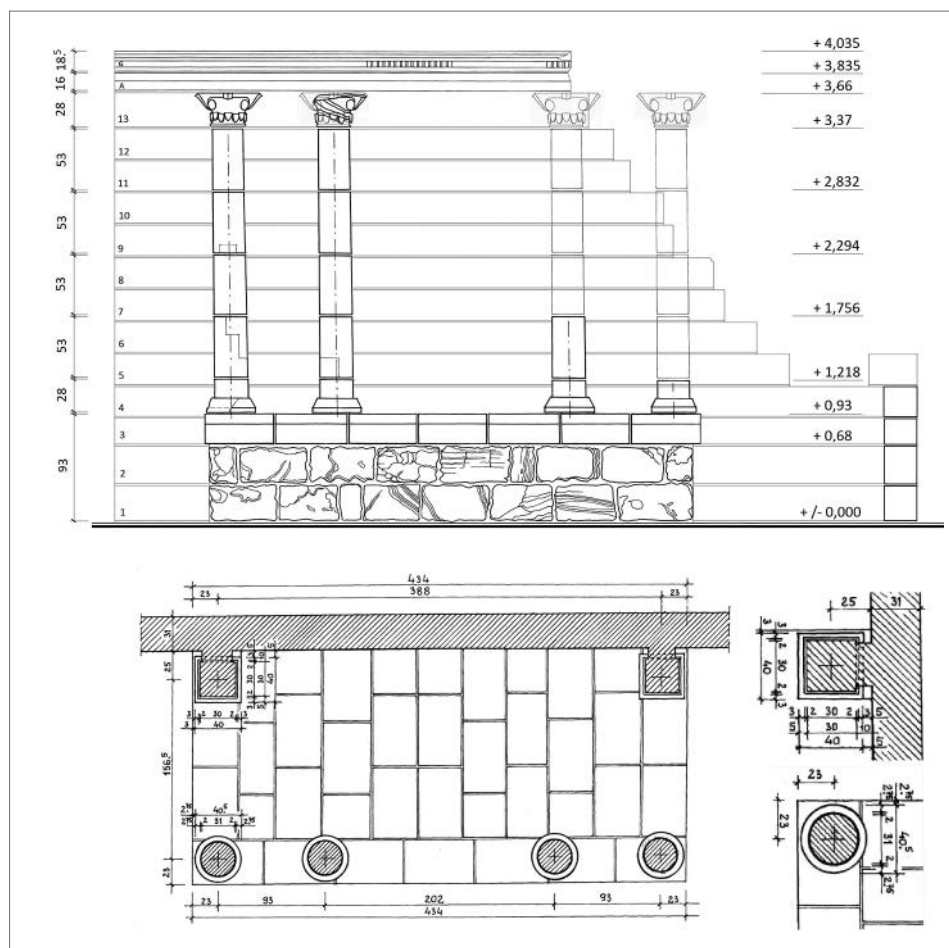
Inventory drawings of the commemorative monument: front elevation elevation, plan and sections (state May 2018) (Polish–Egyptian Conservation Mission | inventory and drawing W. Grzegorek)
